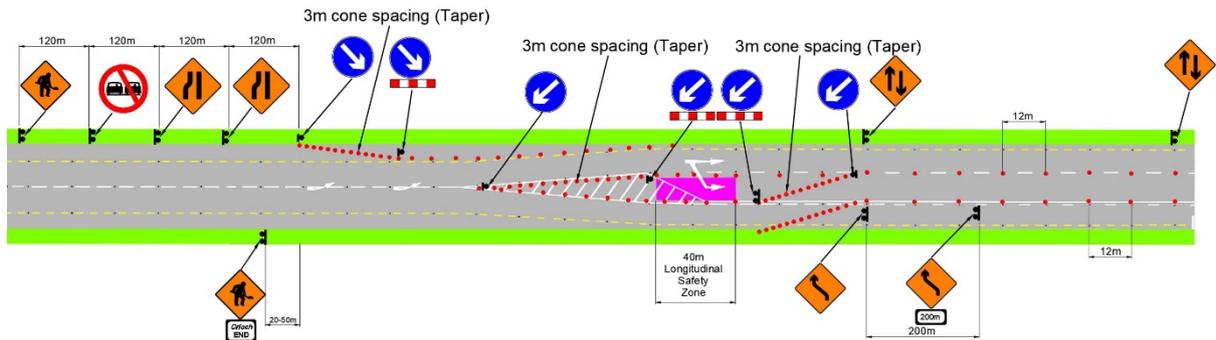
Typical Layout of Overtaking Lane opposite Lane Shift – start of Overtaking Lane
